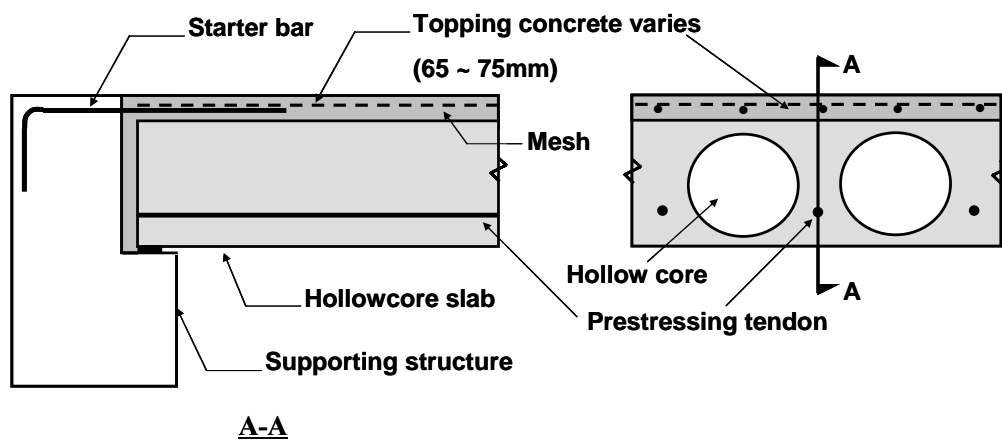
Typical floor-end beam connection detail of hollowcore floors
